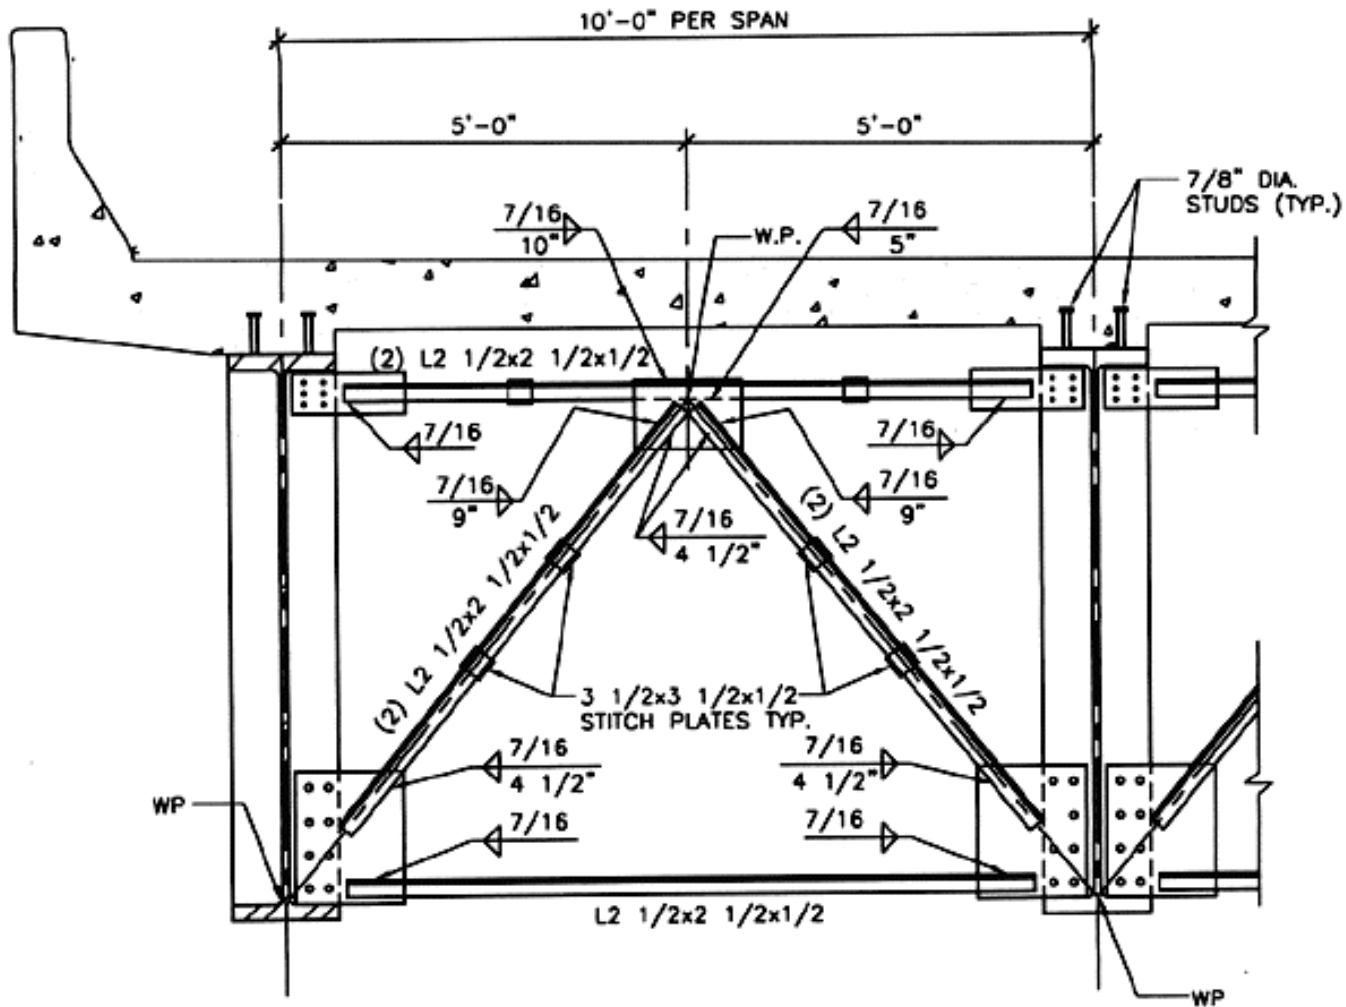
Elevation view of intermediate cross frame of Example 2
